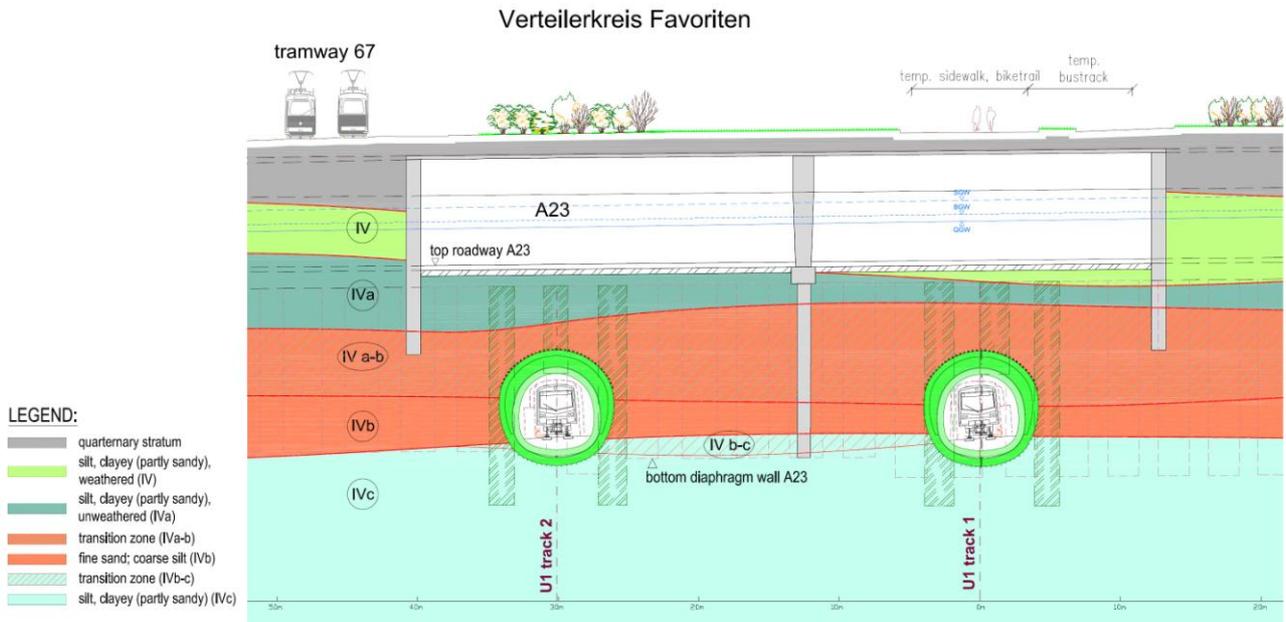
Running tunnel cross-section under the A23 Laaerberg tunnel (Ref. [2])
